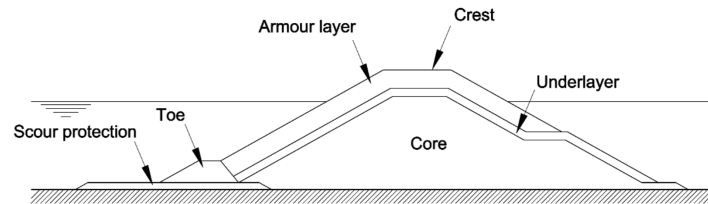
Cross-section of a typical rubble mound breakwater [33].
